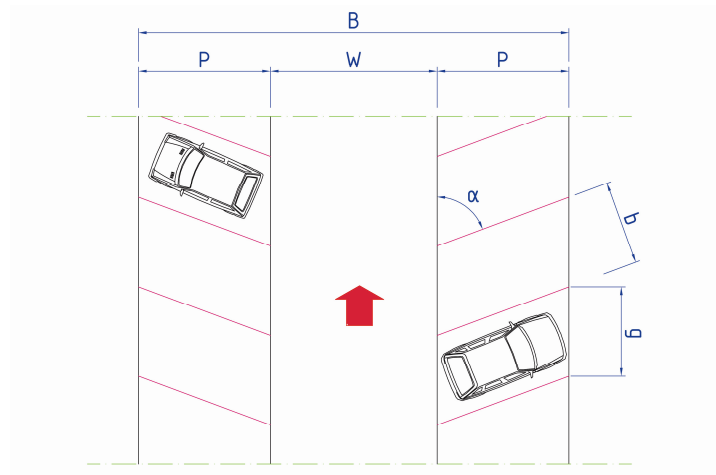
Modular dimensions of a parking in case of a two-sided arrangement with a single parking strip (no parkings back to back) [16]
